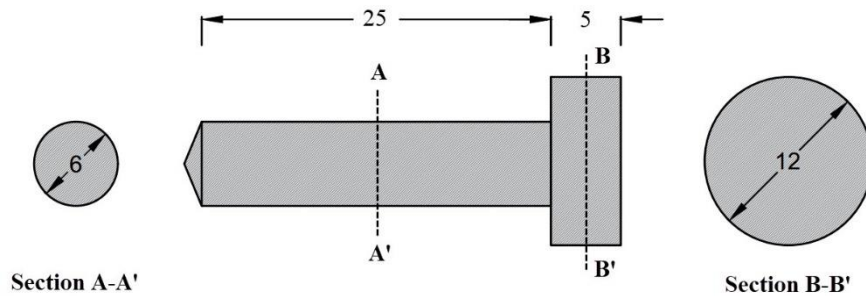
Sketch of shear stud (a) section A-A'; (b) longitudinal section; and (c) section B-B' (dimensions in mm).
